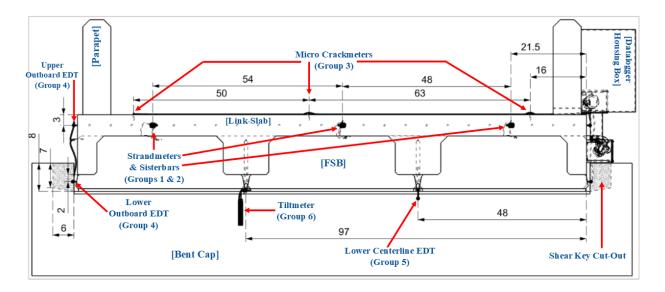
, Drawing, Bridge End View No.1 (from Northwest Perspective)
